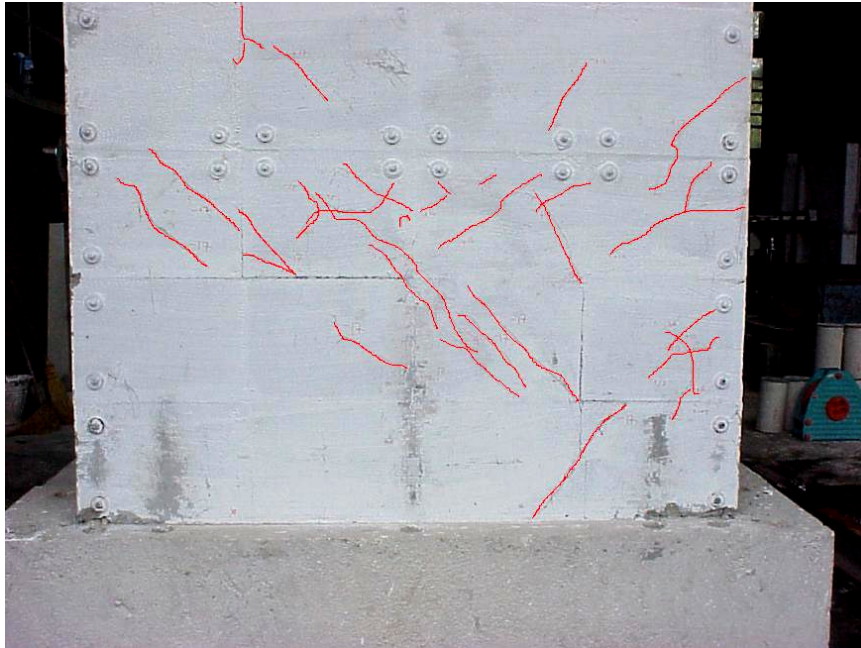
Crack pattern on the first story panels, Specimen CEE4
